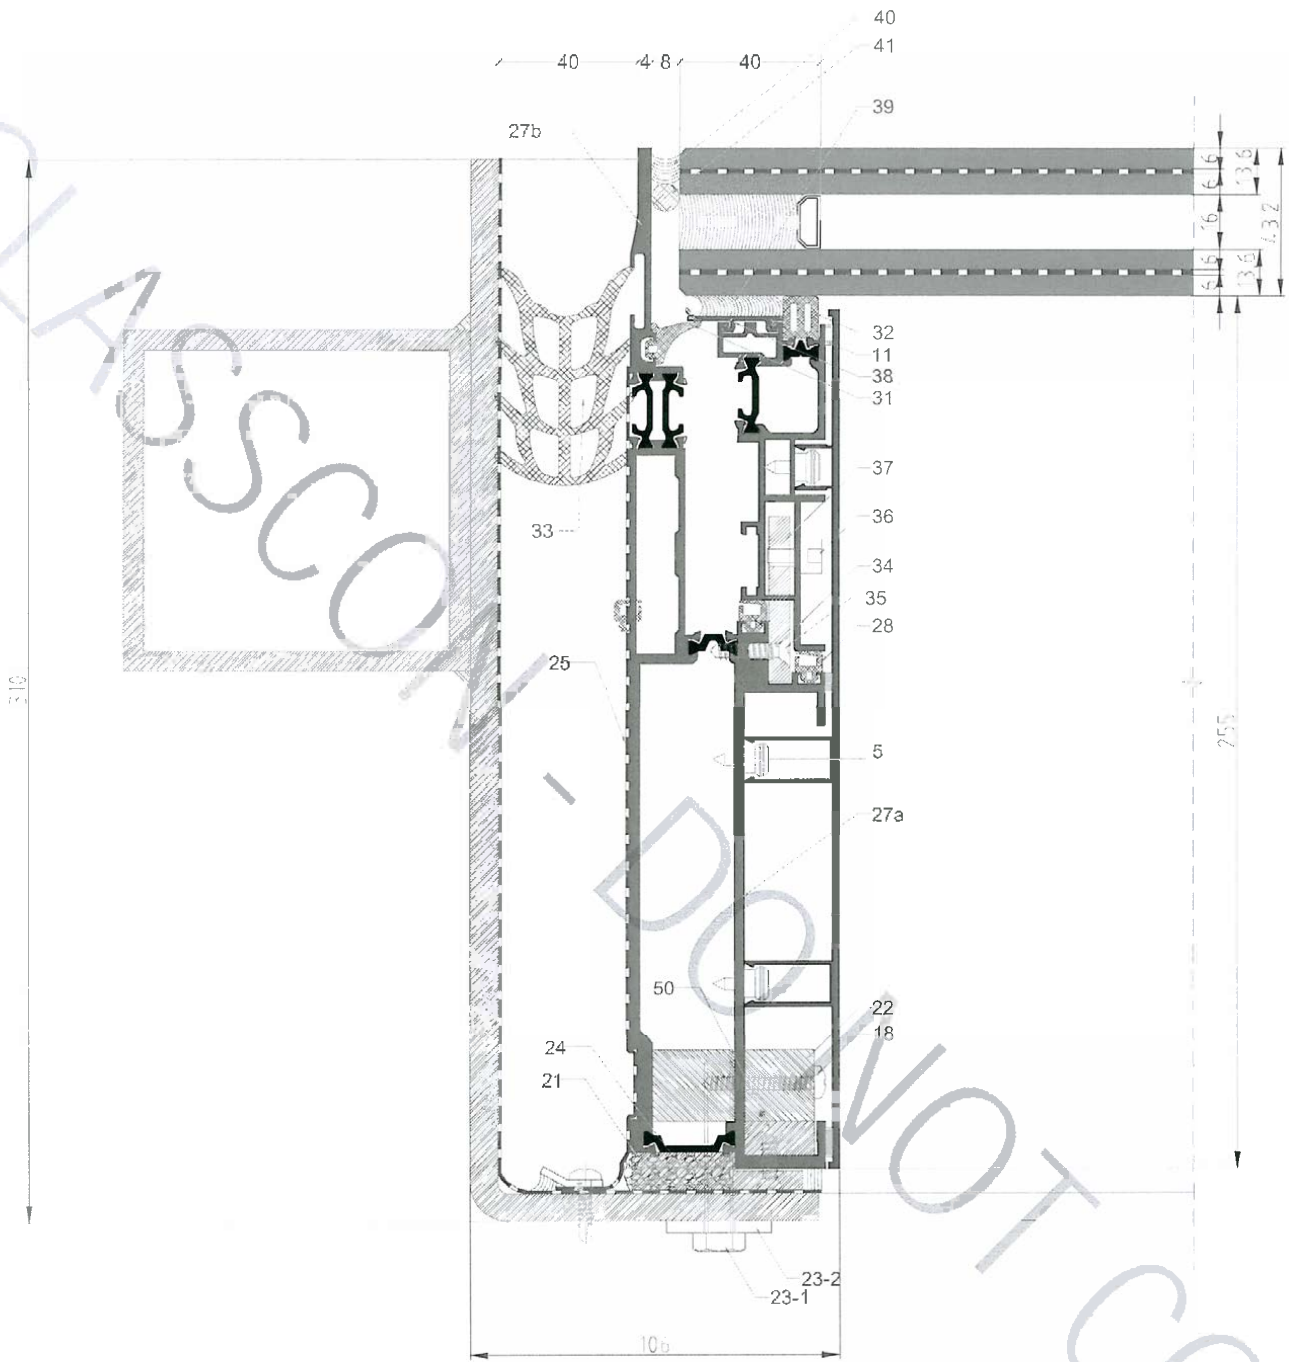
Detail of the lateral node of the horizontal section B-B, of the tested sample (declared nominal dimensions are expressed in mm)
